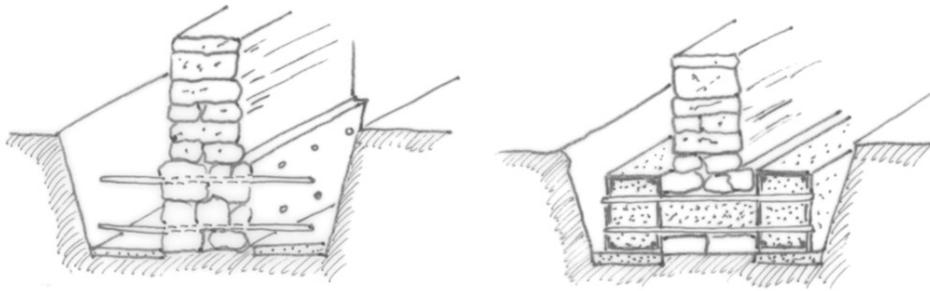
Widening a foundation with concrete or terracotta bricks
